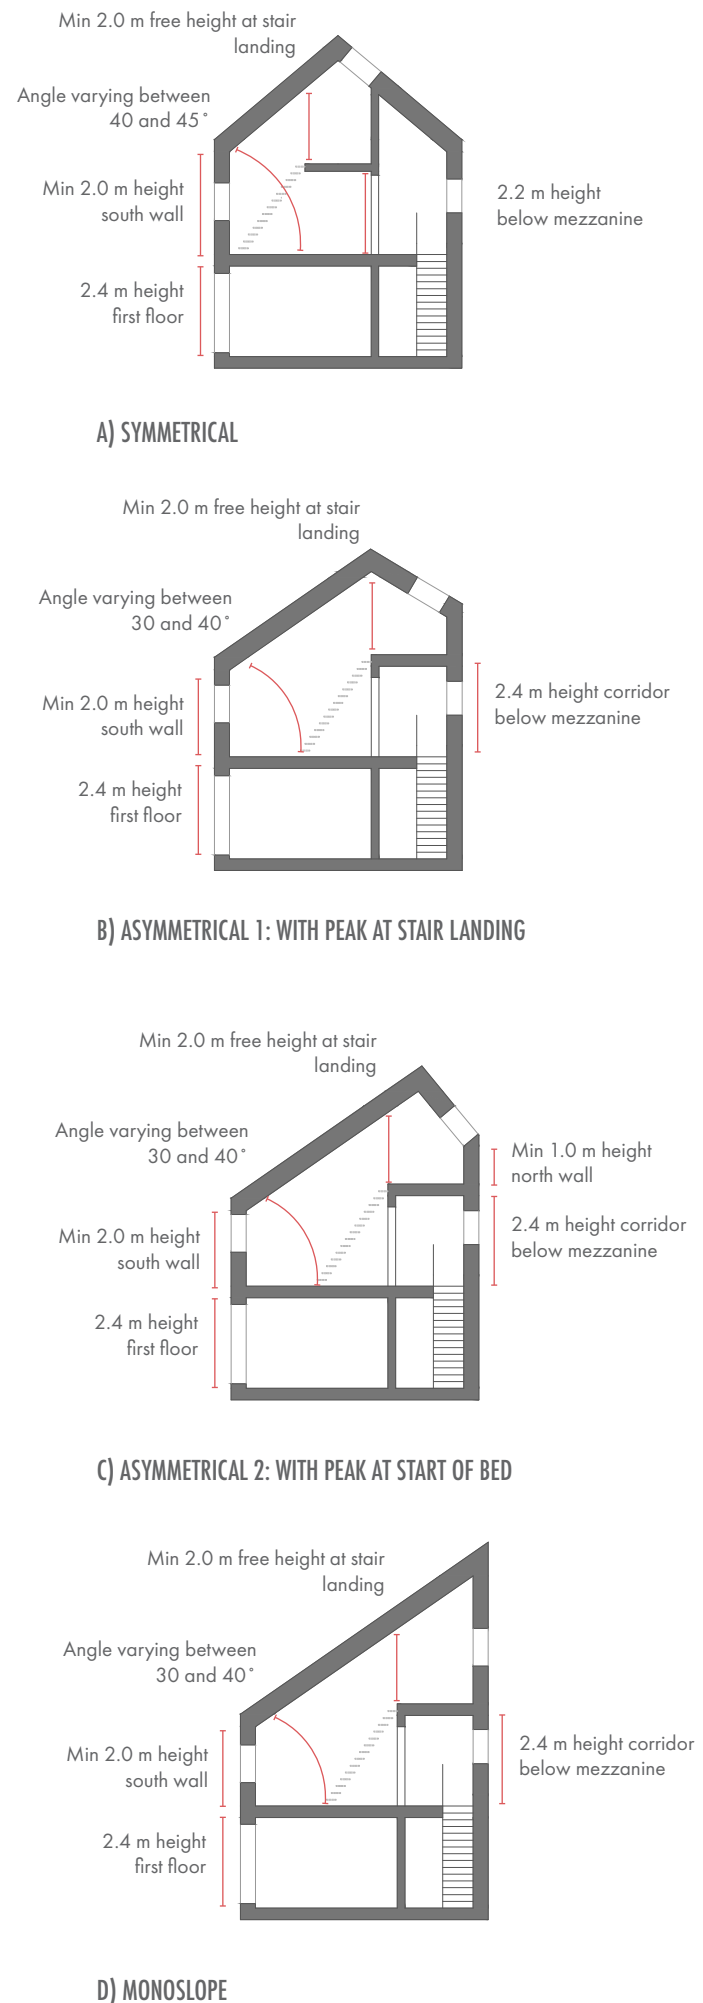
TYPES OF ROOF SHAPE TESTED AND DESIGN CONSTRAINTS, SCALE 1:200
